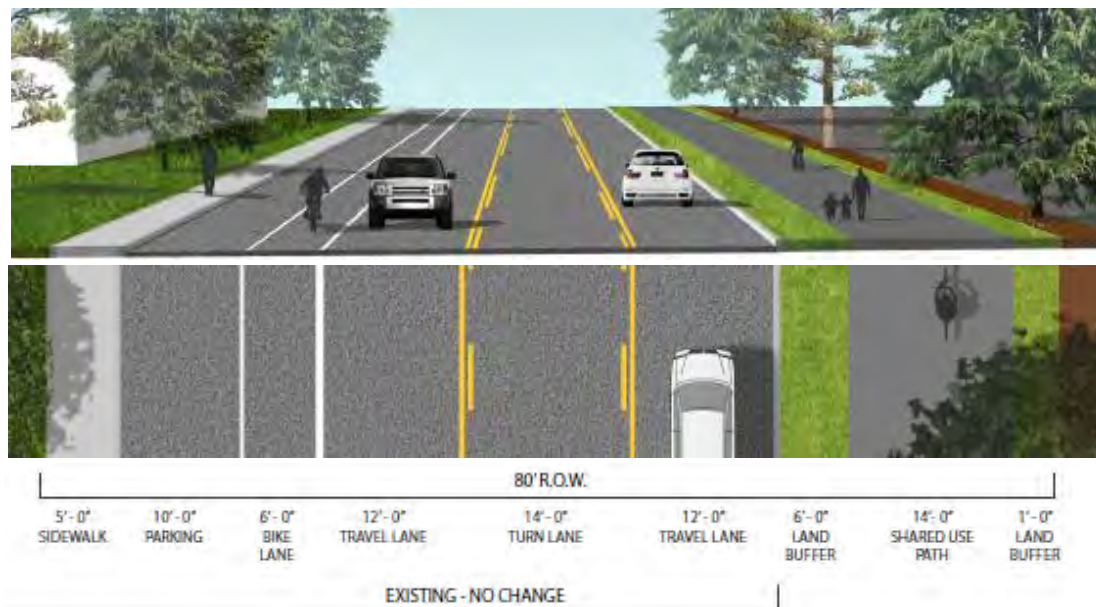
Mt. Hood Community College – South: NE 17th Street – Existing roadway plus a shared use path on the north side of the street adjacent to Mt. Hood Community College.
